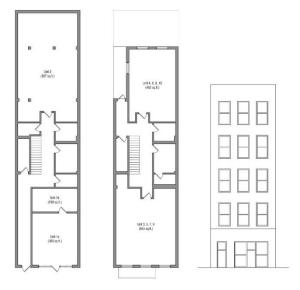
, 266, 267 (left to right): Building 9, first (ground) floor (1930); floors 2–5 (1930); street-front elevation (1974). For plans, north is up.
